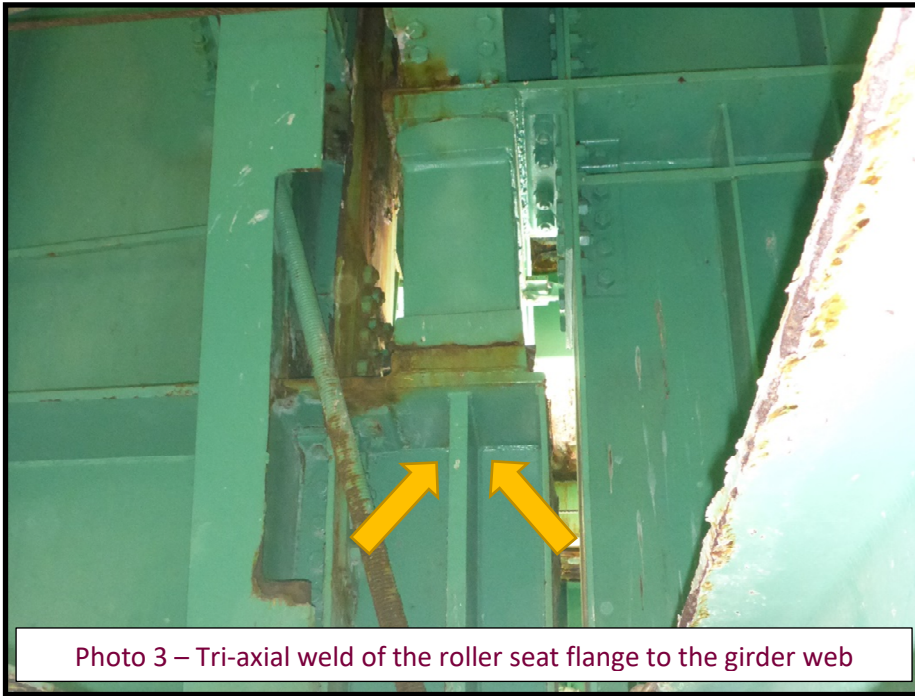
Tri-axial weld of the roller seat flange to the girder web
